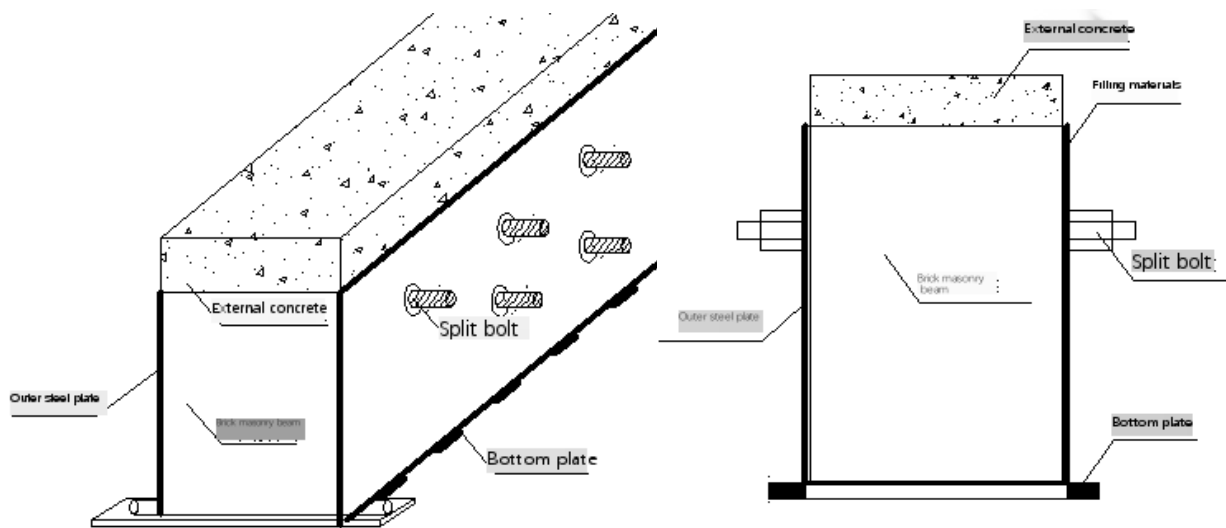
Basic composition diagram of steel plate-brick masonry composite beam
